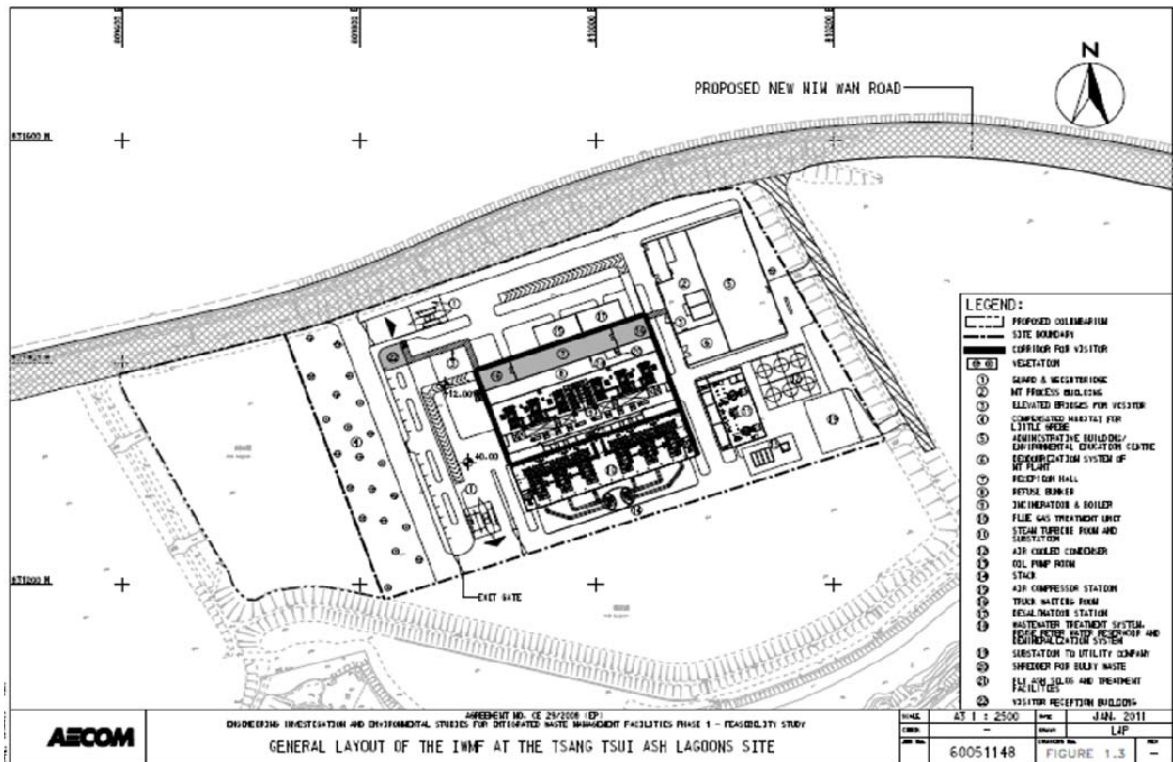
Layout plan of the proposed IWMF Phase 1 (Tsang Tsui Ash Lagoons site)
